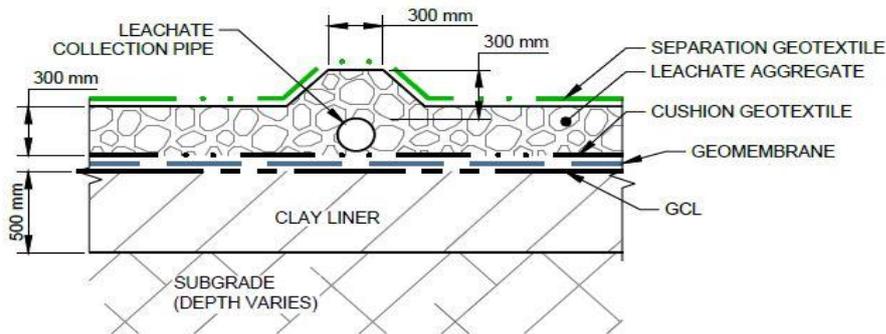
Typical Quarry Floor Detail, extract from Figure 27
